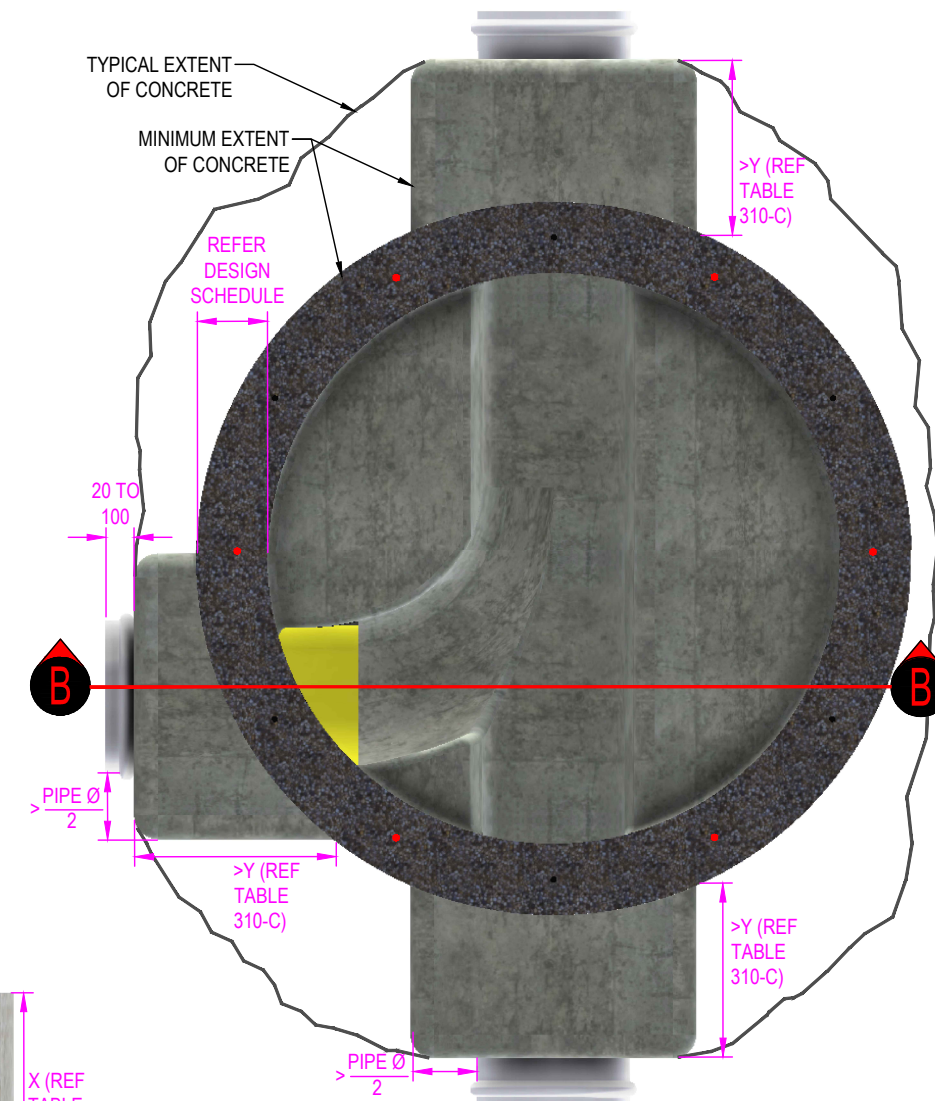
C: TYPICAL MANHOLE BASE (PLAN VIEW)
